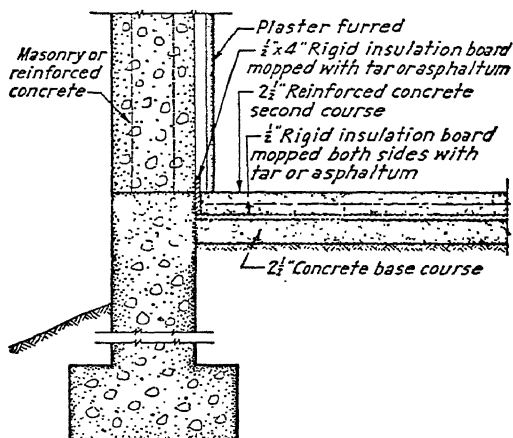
Section Showing Insulated and Water-proofed Concrete Floor
